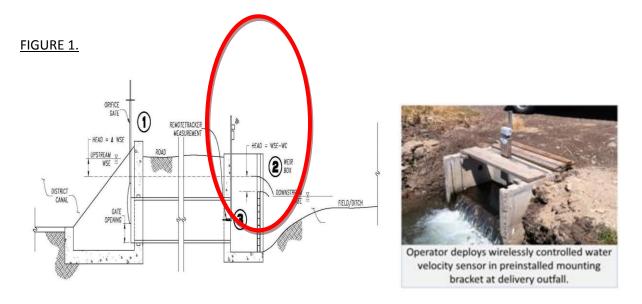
Typical field turnout with addition of concrete weir box shown in the oval. Photo to the right shows the portable Doppler meter installed in the proposed concrete weir box.
